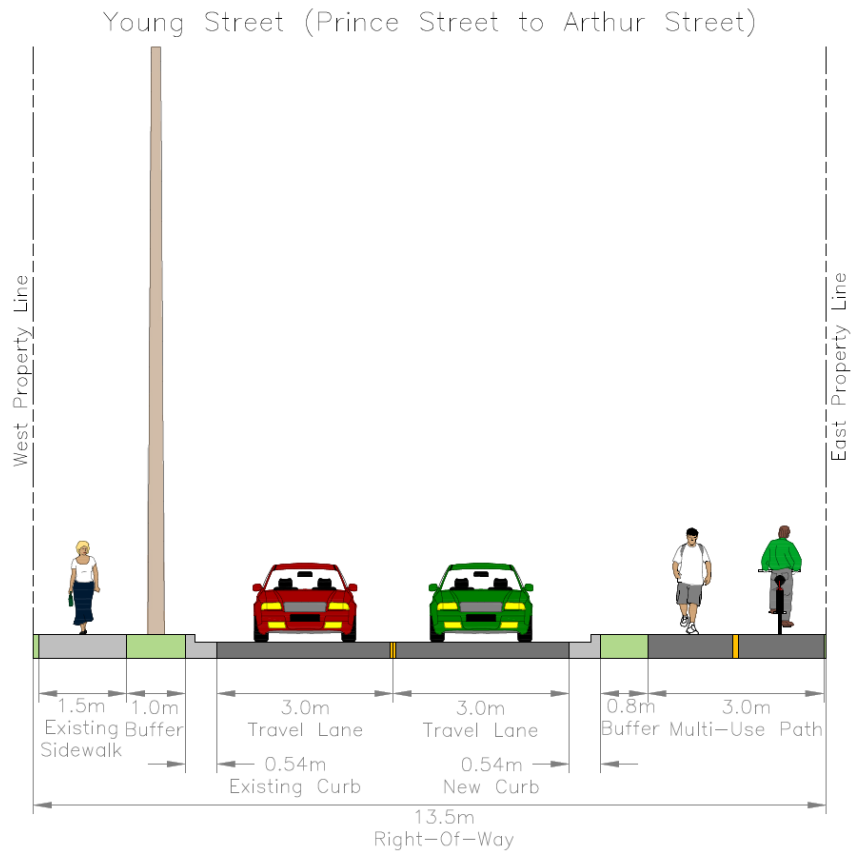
Young Street between Prince Street and Arthur Street, Revised Cross Section
